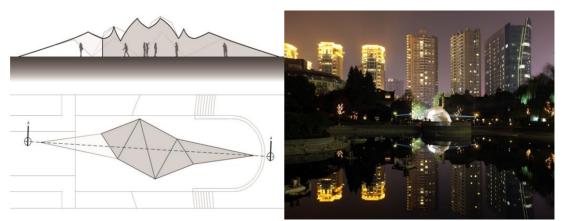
Plan view, JNBY by HHD_FUN Architects, Photo: n.d.
